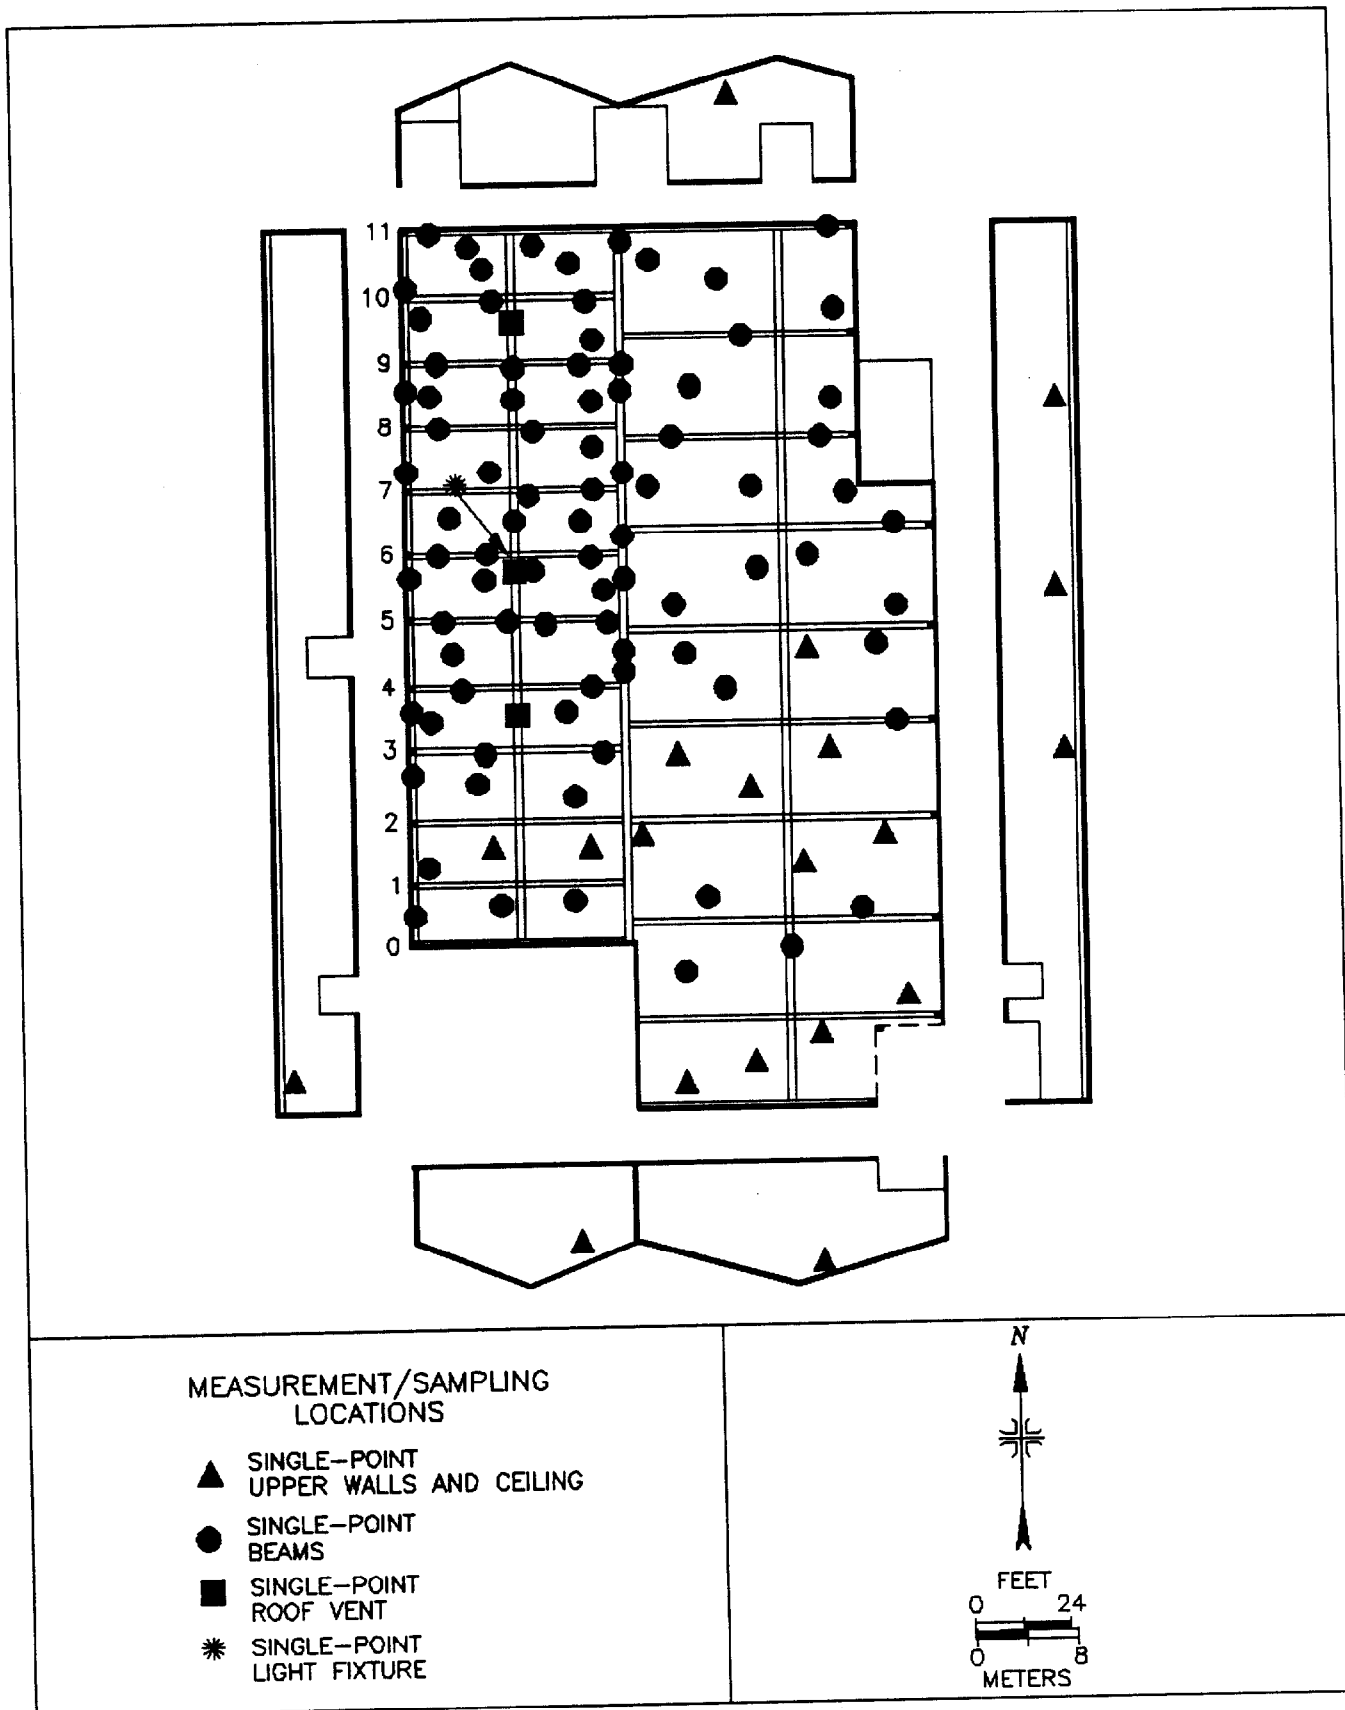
Building 3, Upper Surfaces - Measurement and Sampling Locations
